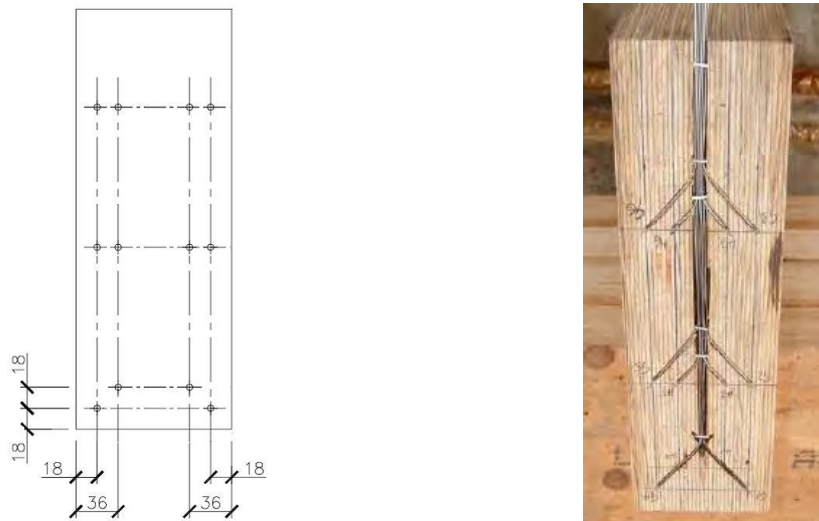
Thermocouple layout with dimensions in mm (left) and instrumented beam cross-section (right) [Lane 2005].
